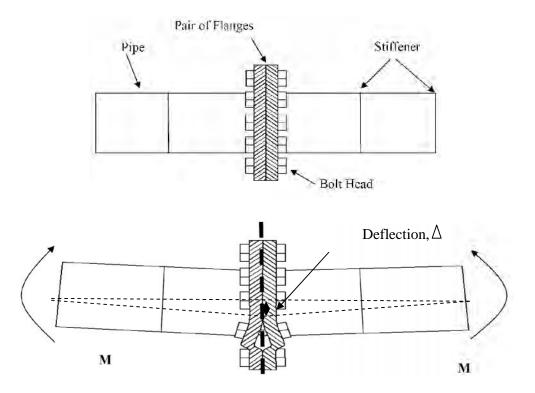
Front view and deflected shape of a schematic flanged pipe joint
